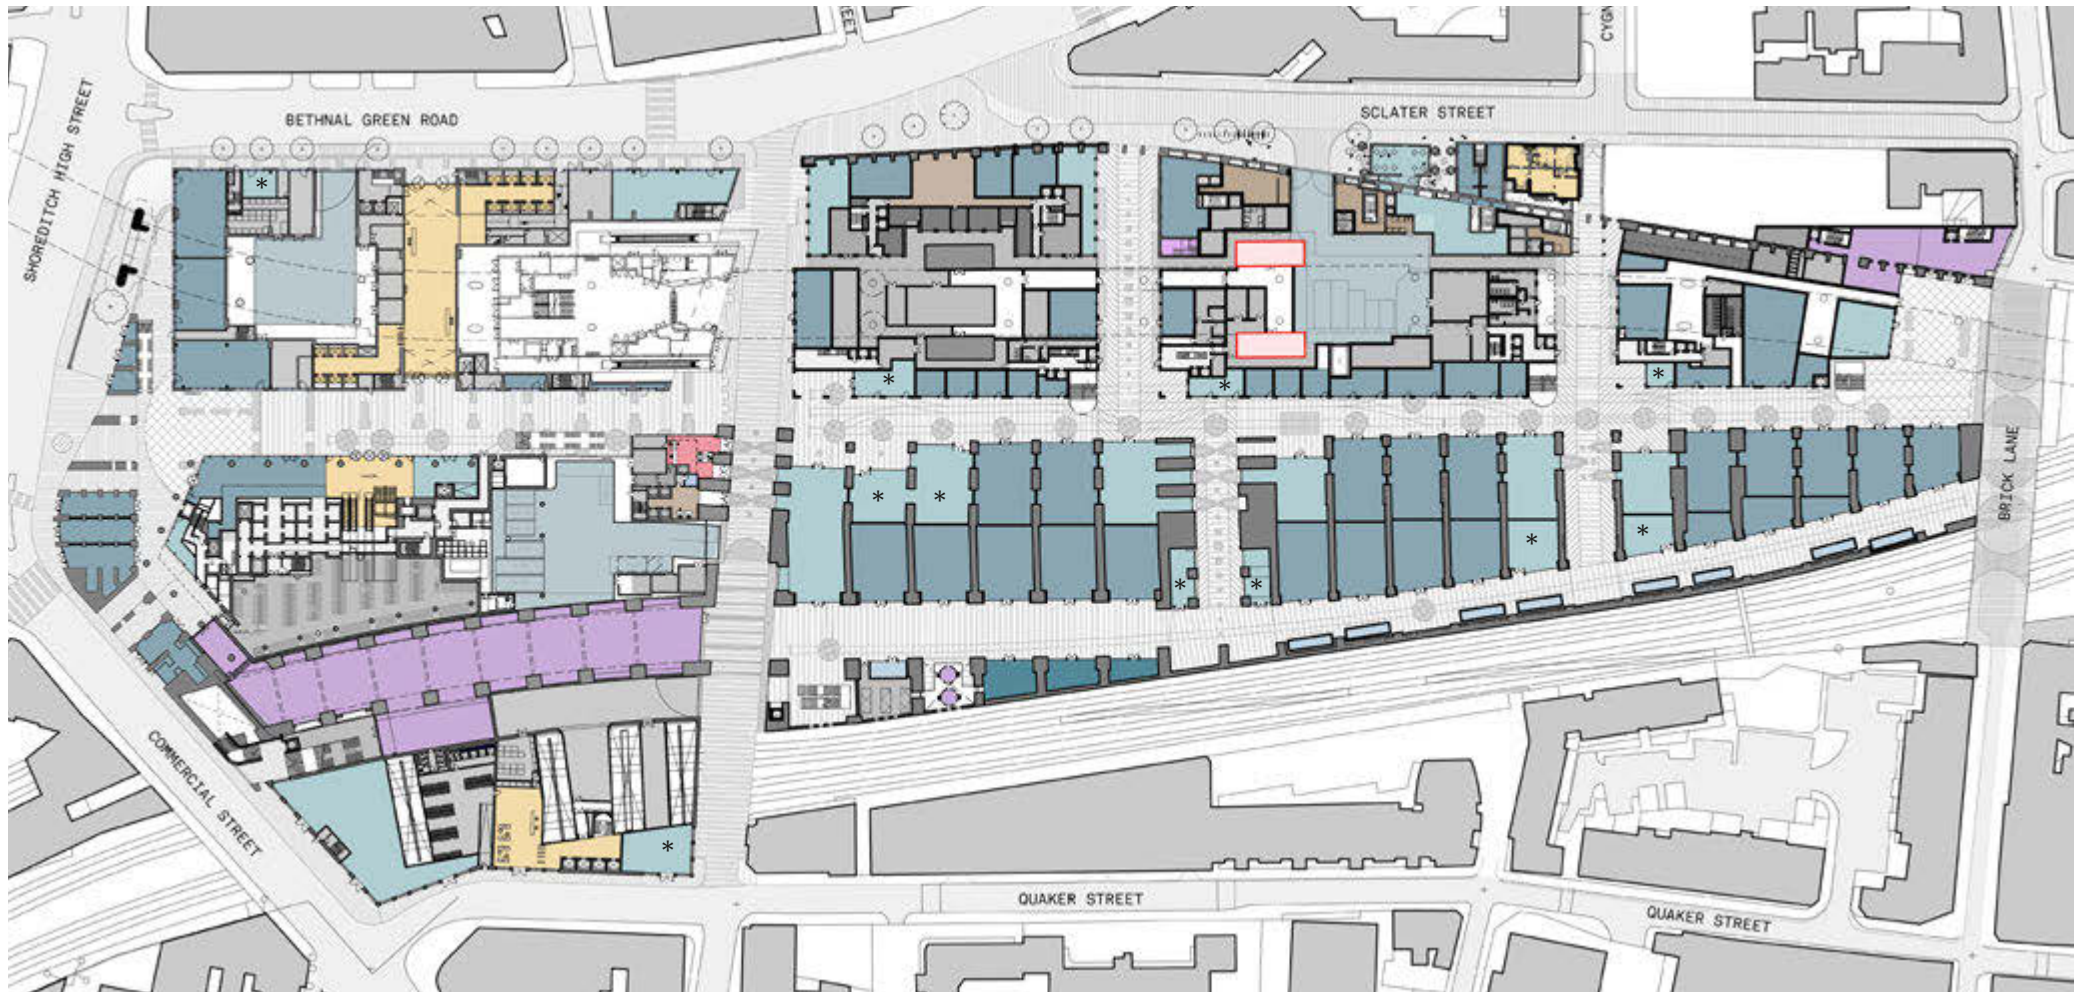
Ground Level Illustrative Layout, 2019
